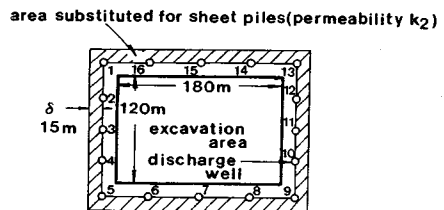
Excavation area and arrangement of discharge wells with sheet piles.
